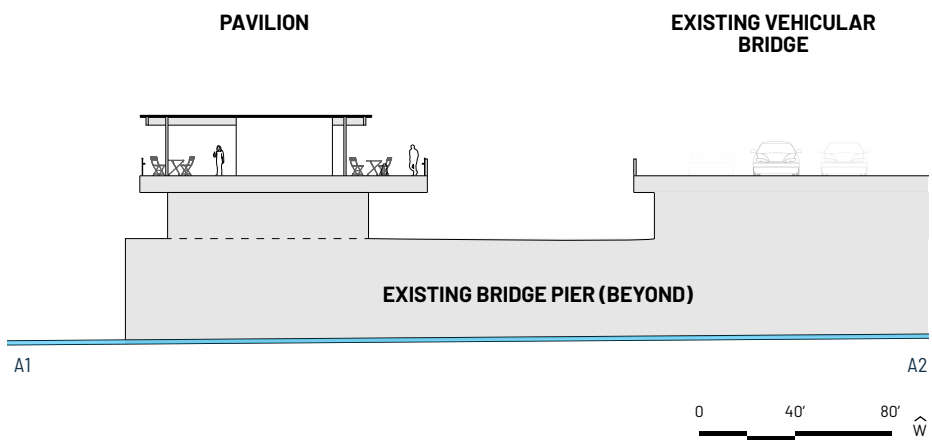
An example section through the Los Feliz Bridge shows how an additional pedestrian river crossing created on the existing bridge piers.
